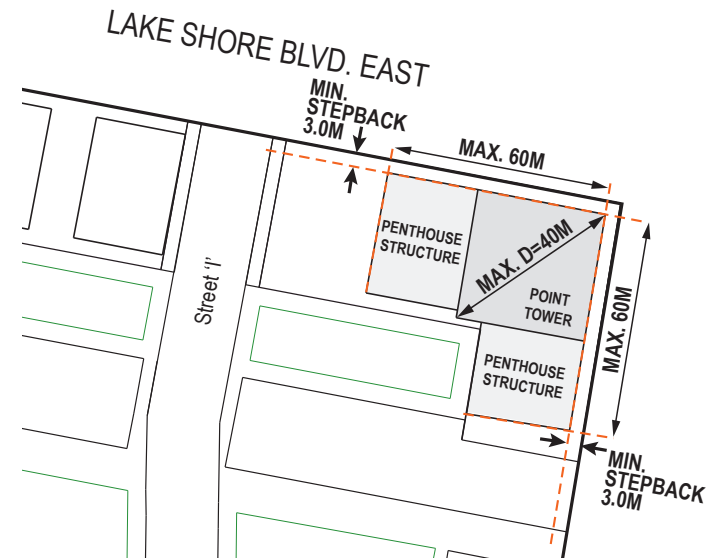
Point tower parameters- dimensions, step backs penthouse structures adjacent to towers.
